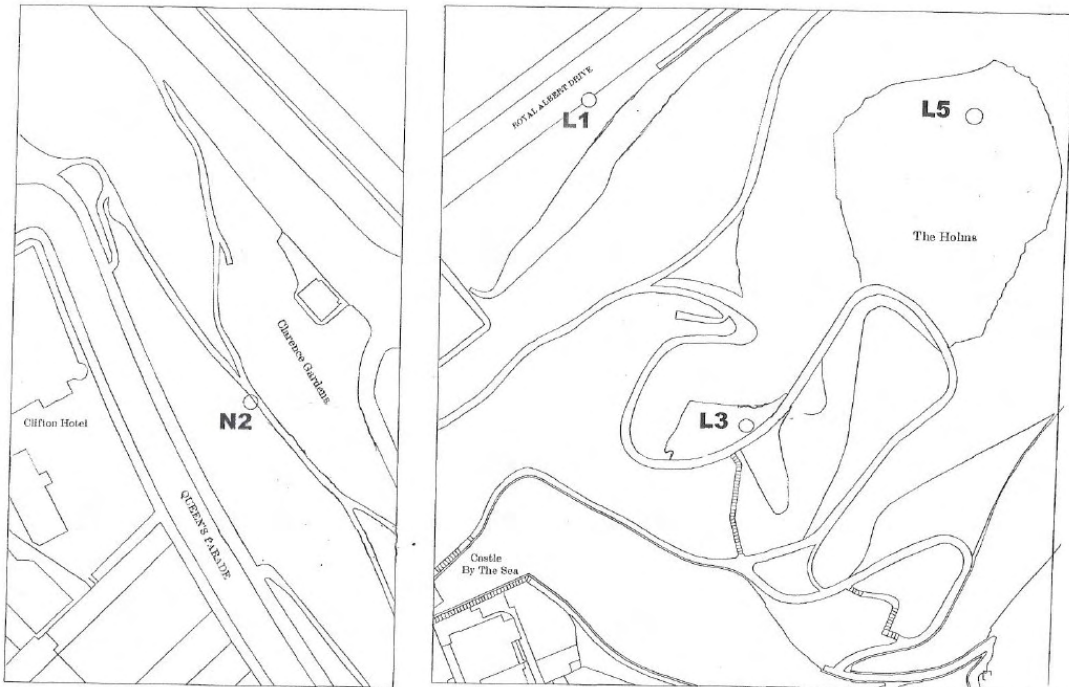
Site Plan of Whitby West Cliff (Inclinometer)
